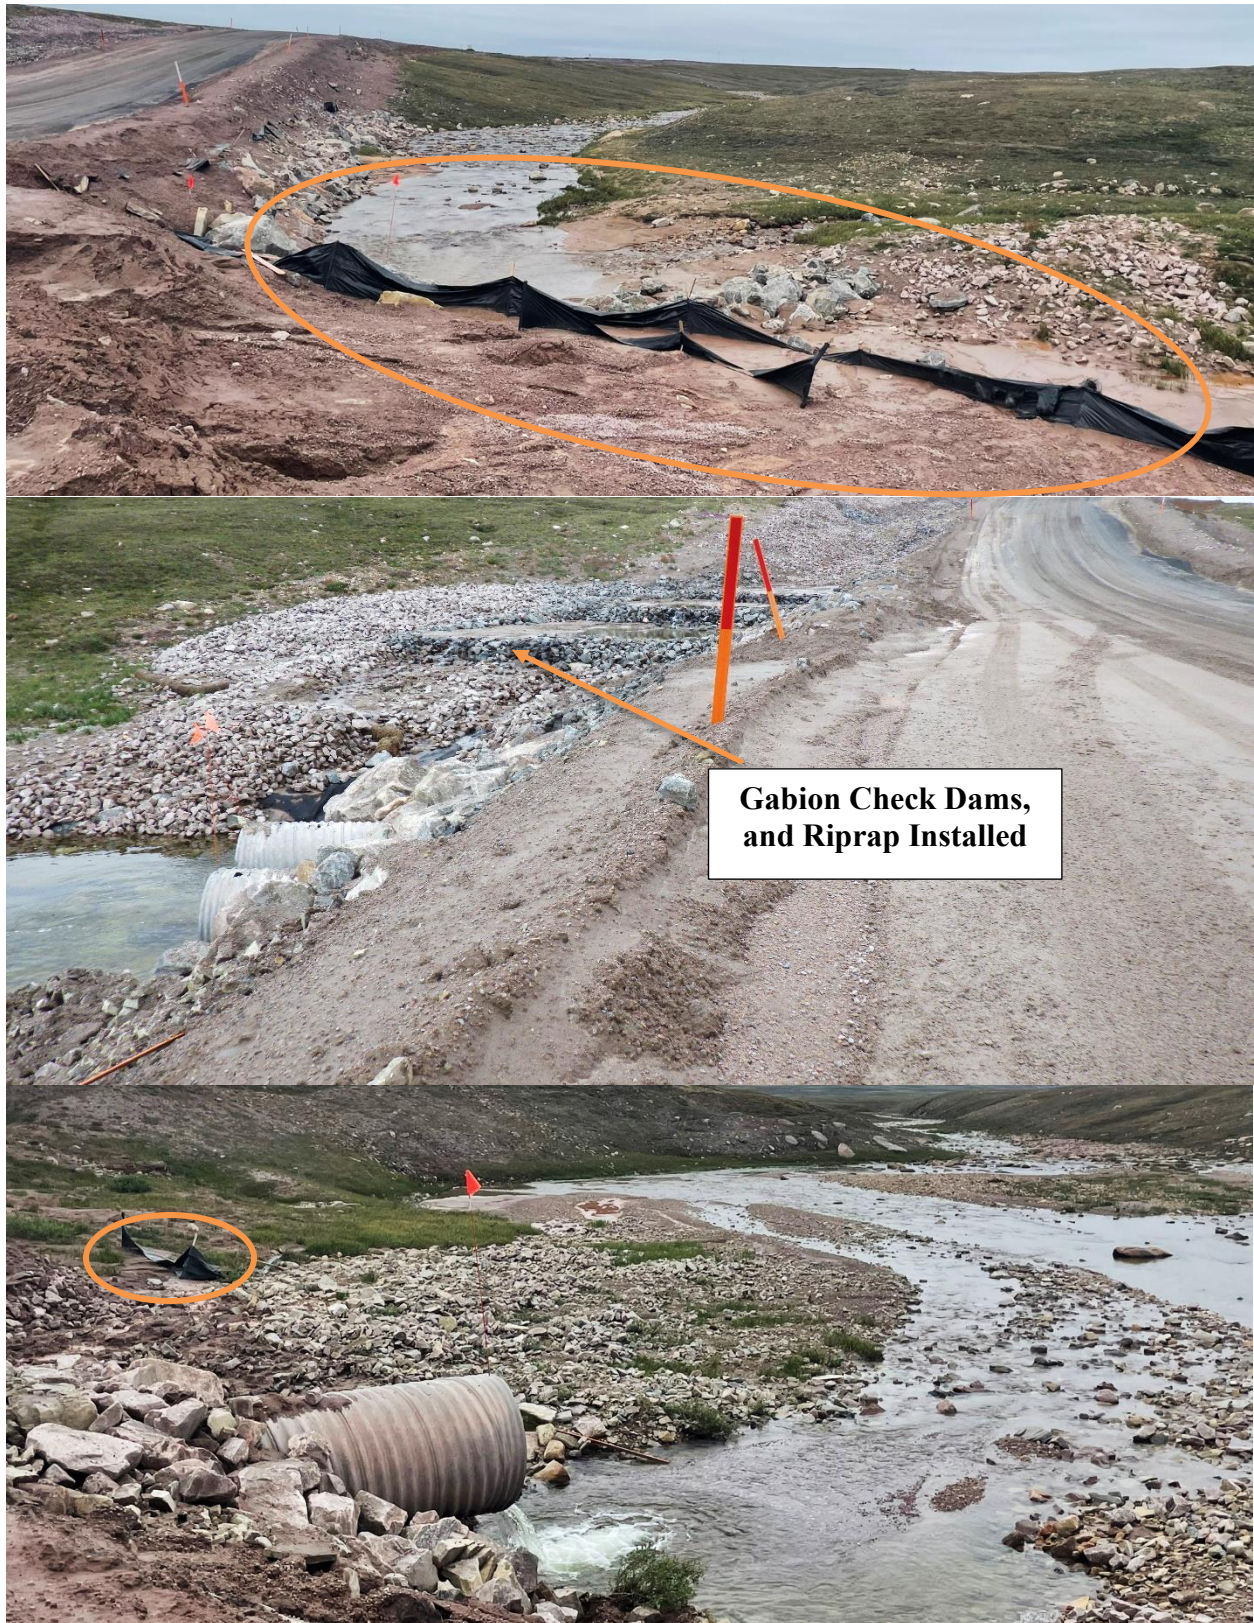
Functioning culvert with adjacent silt fence in poor condition: sagging and sediment buildup noted
